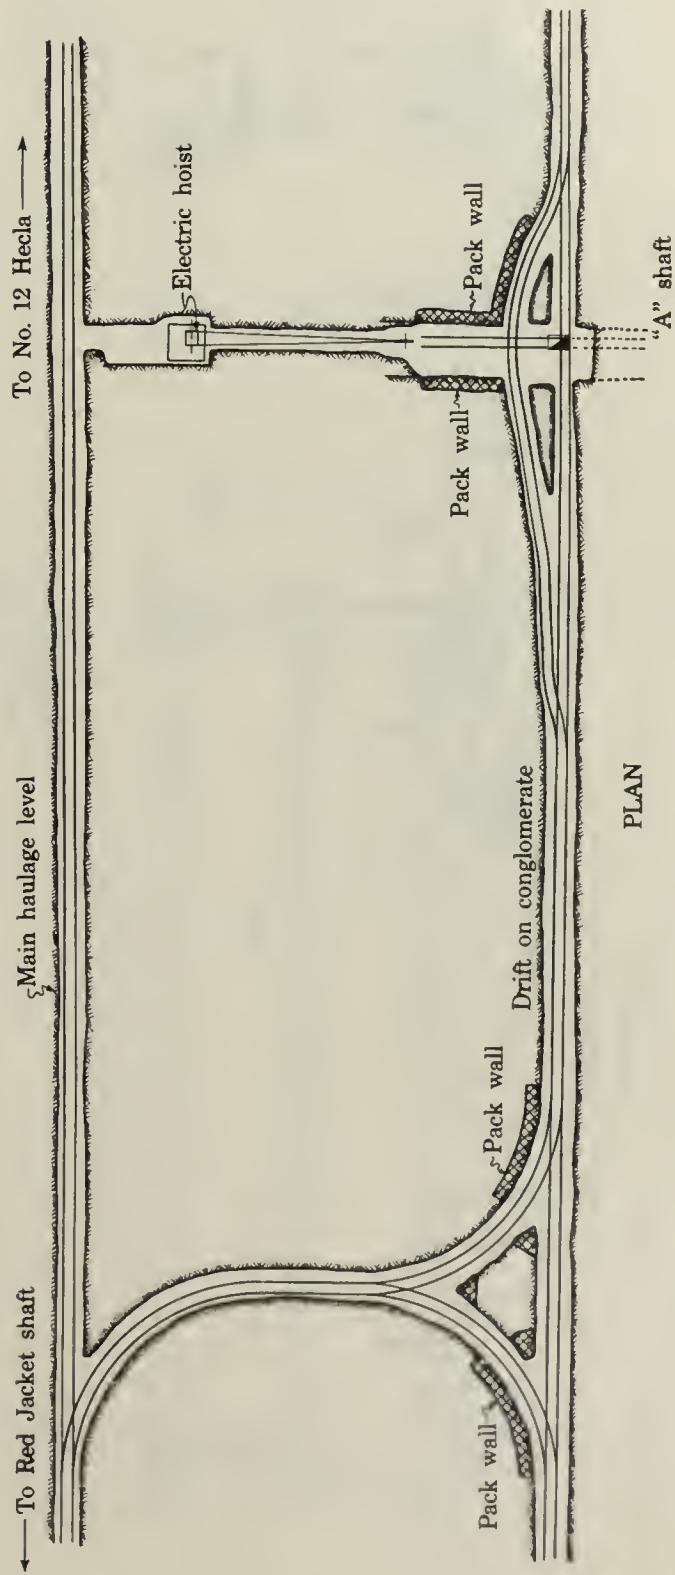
Collar layout at "A" shaft, showing electric hoist
